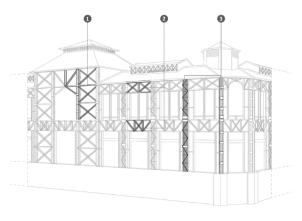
Components of the structure of the exterior facade of El Mercado. 1) braced walls 2) lattice beams 3) simple composite column and bracing (drawing by Katherine Cabezas)
